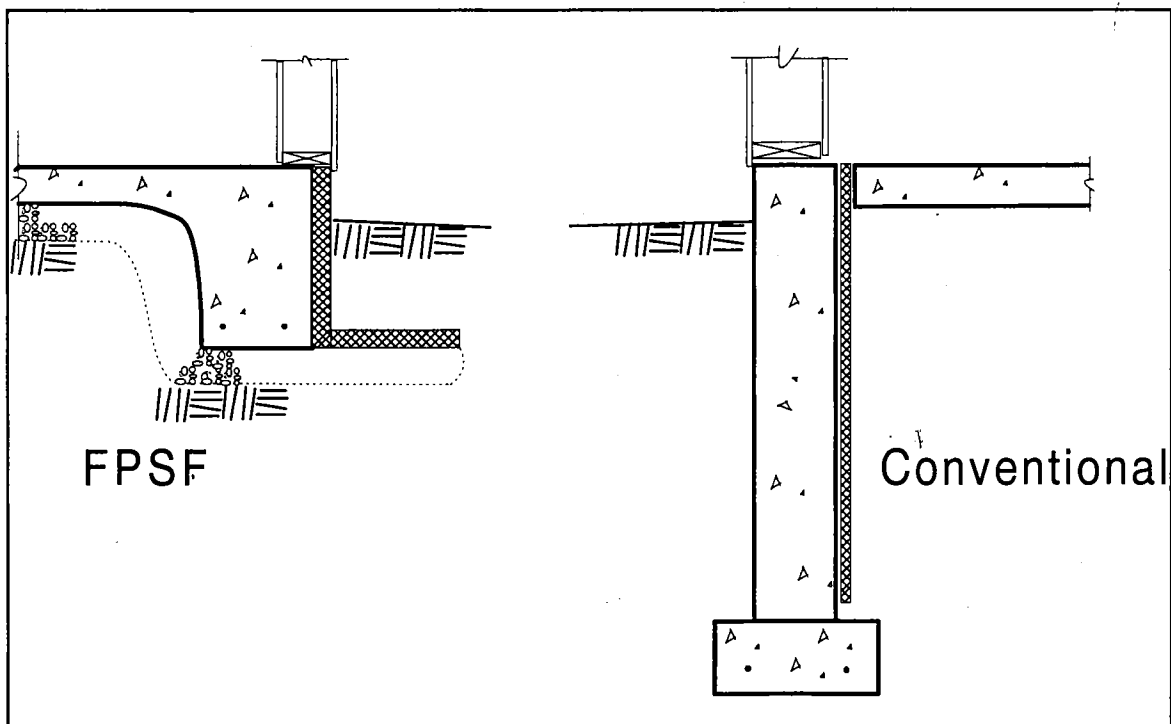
A frost protected shallow foundation in comparison to a conventional house foundation.
